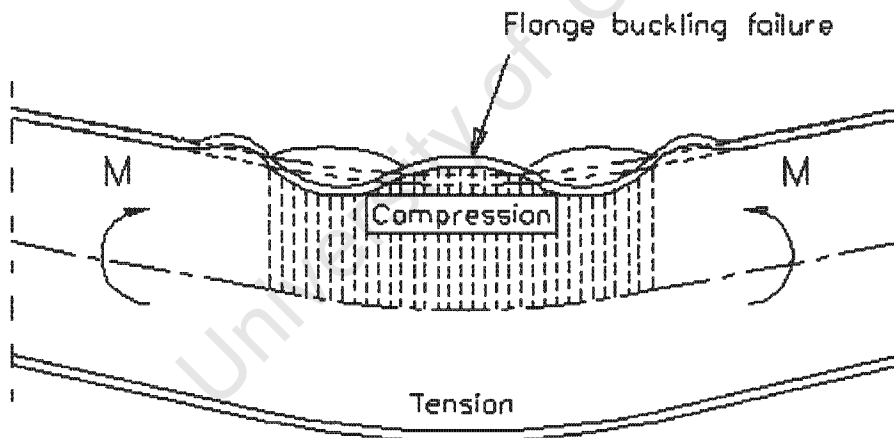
<sup>[81]</sup> - Local flange buckling failure
